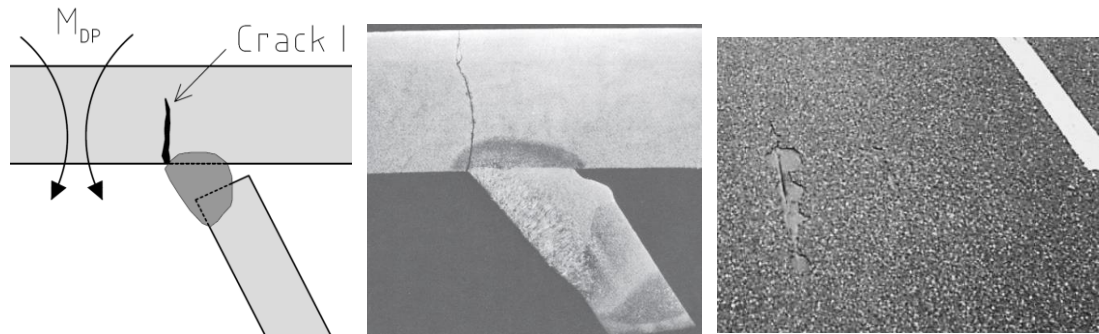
Crack I in the deck plate at the connection to the longitudinal rib (a) Structural overview; (b) Section Crack I from an experiment (Kolstein, 2007); (c) Possible consequences that can arise from this crack (Kolstein, 2007)
